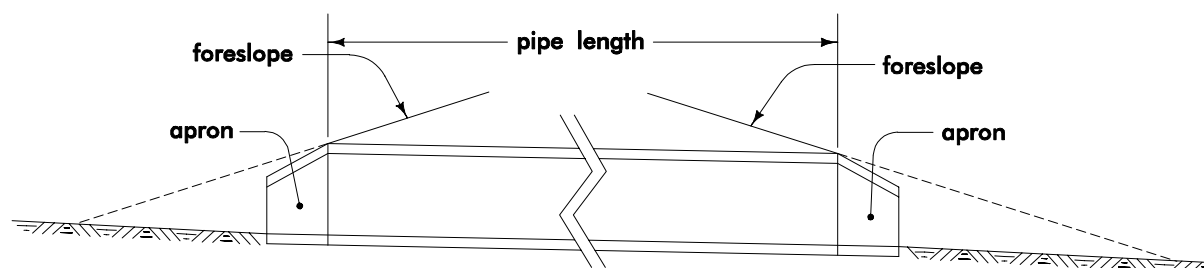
Determining pipe length in CADD. Note: pipe length will require adjustment if concrete pipe is specified, see Example 2.
